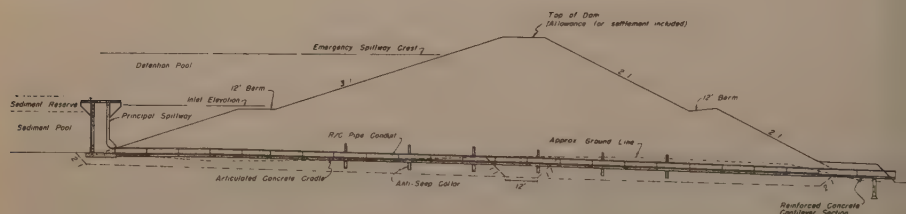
TYPICAL SECTION OF A FLOODWATER RETARDING STRUCTURE
